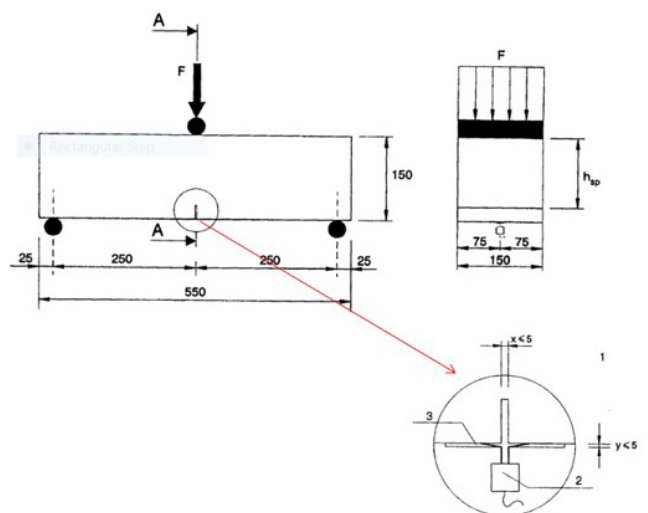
EN 14651 Notched Beam Test for determining Structural Design Values
